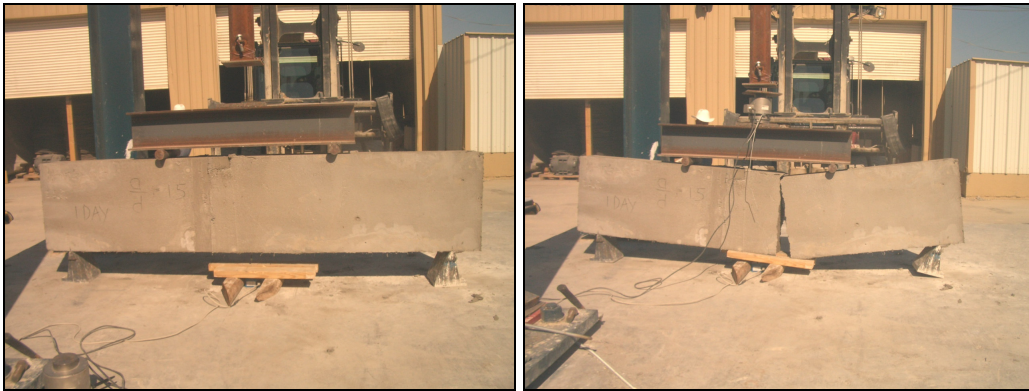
Beam for 1<sup>st</sup> batch concrete cast on 11/2/06 for 1 day test;
